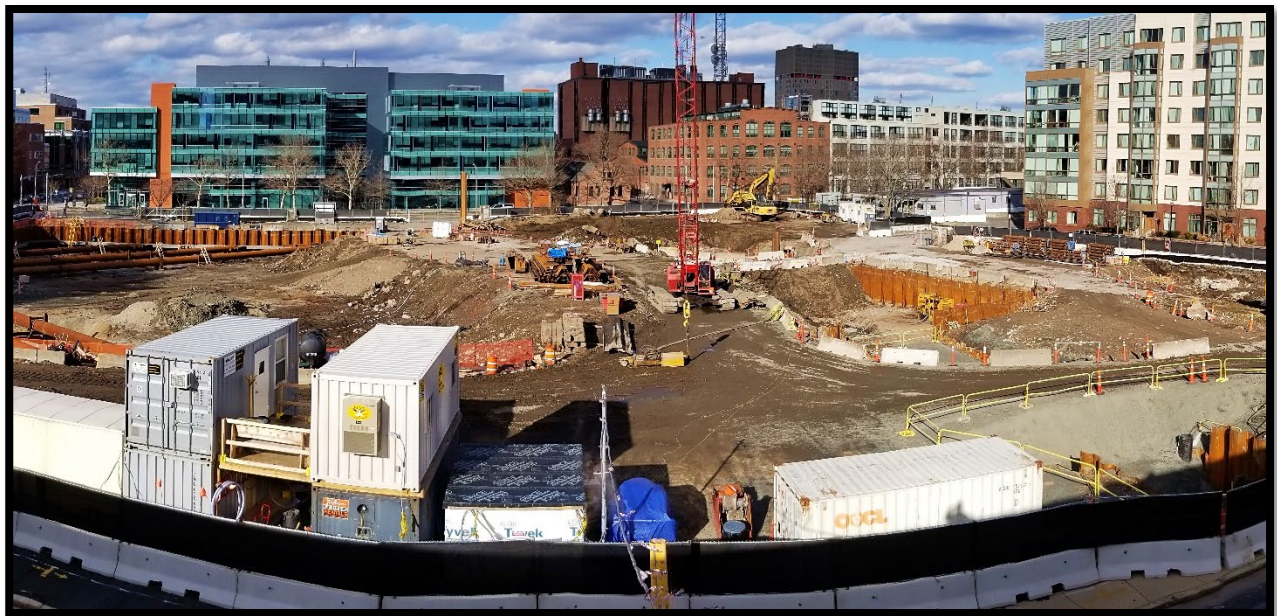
Construction at U.S. Department of Transportation Volpe Center Cambridge, MA
